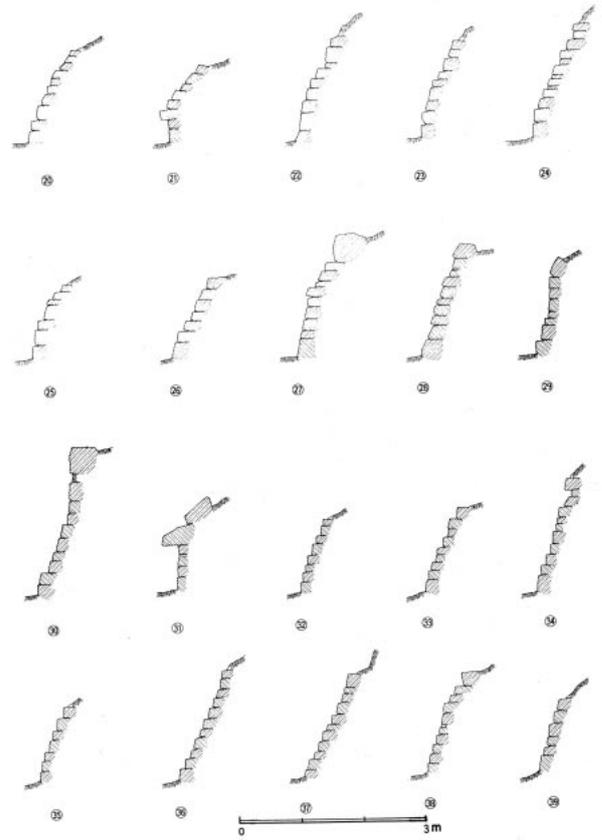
Anapitch, Shore Protection Stone Wall (cross section)
